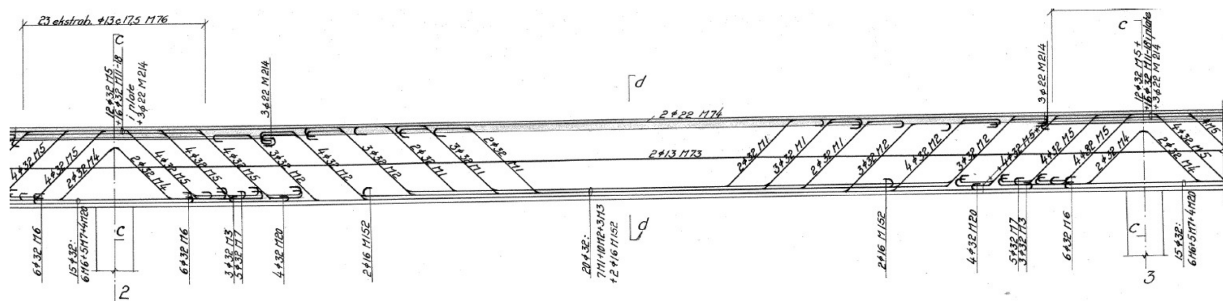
Sketch of the reinforcement in the mid beam on Elgeseter bridge [22]
